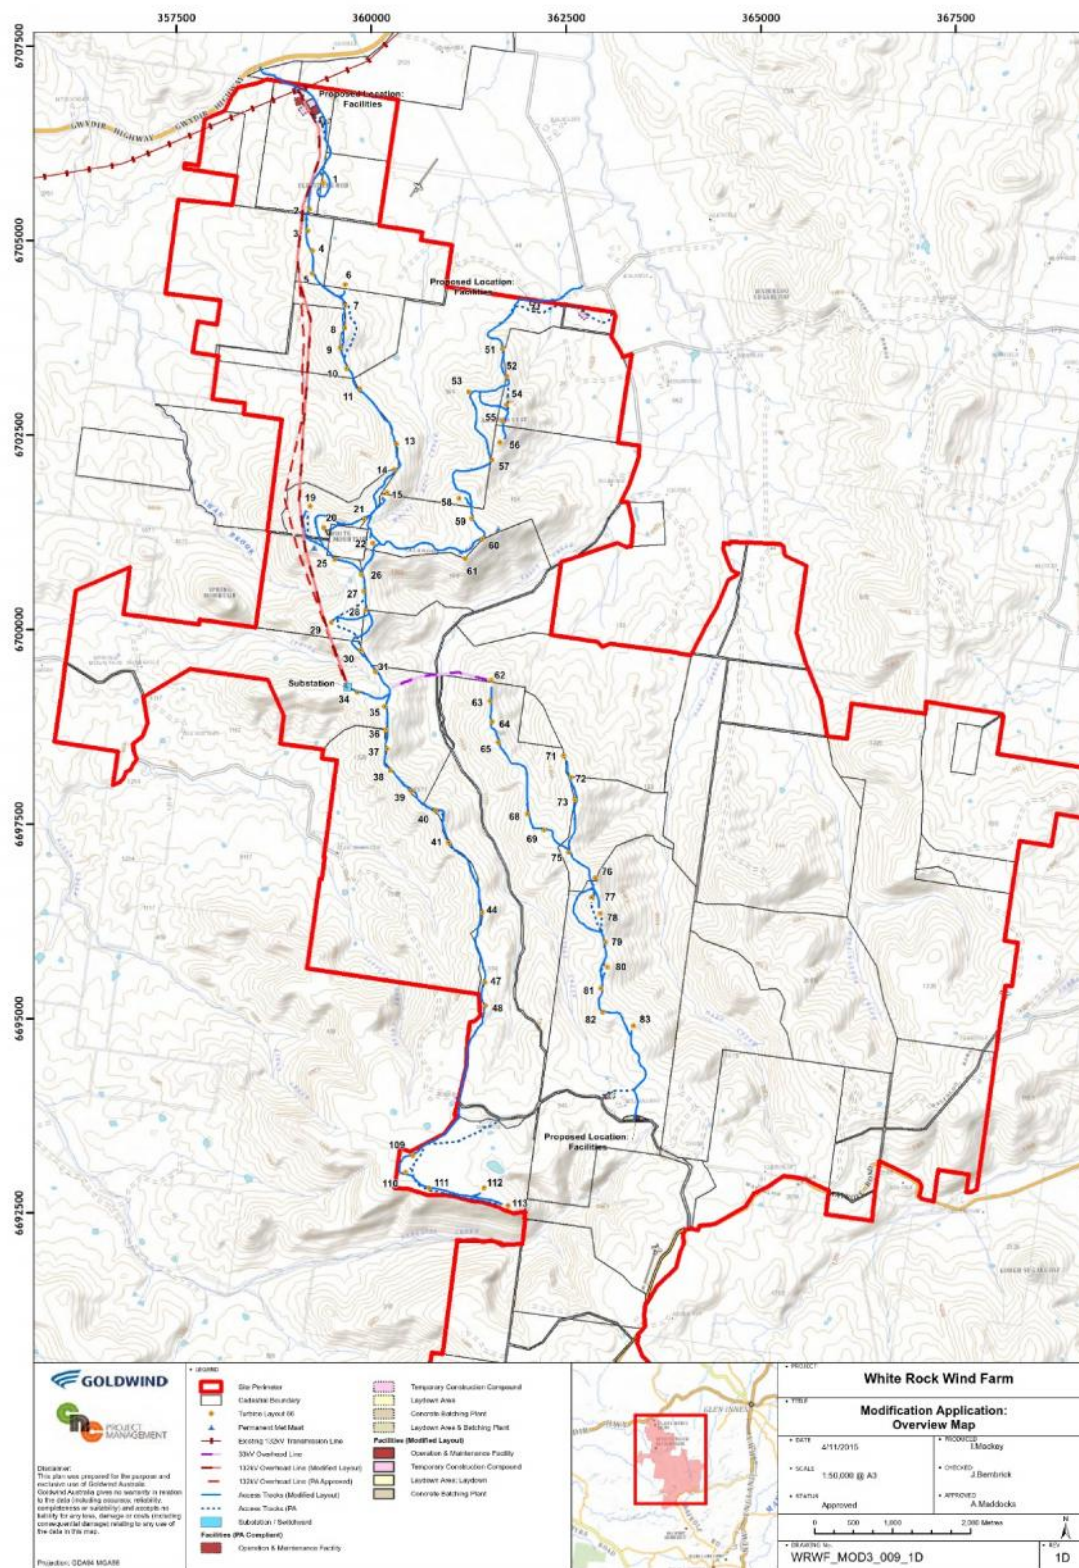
WRWF Stage 1 – Indicative Modified Construction Layout
